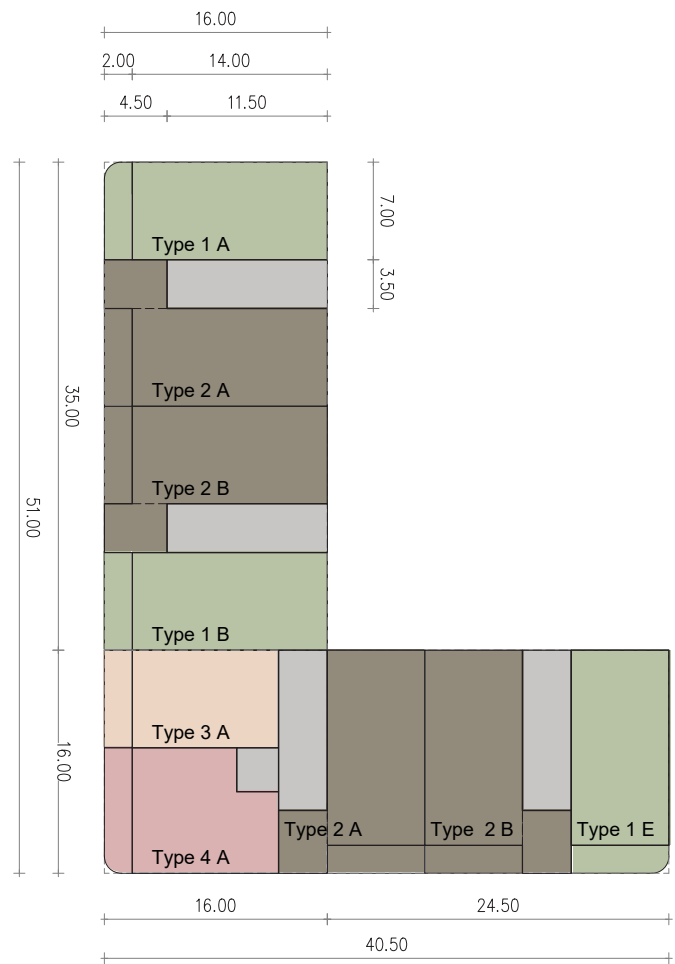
Floor plans typologies studies V06 A, final design proposal.
